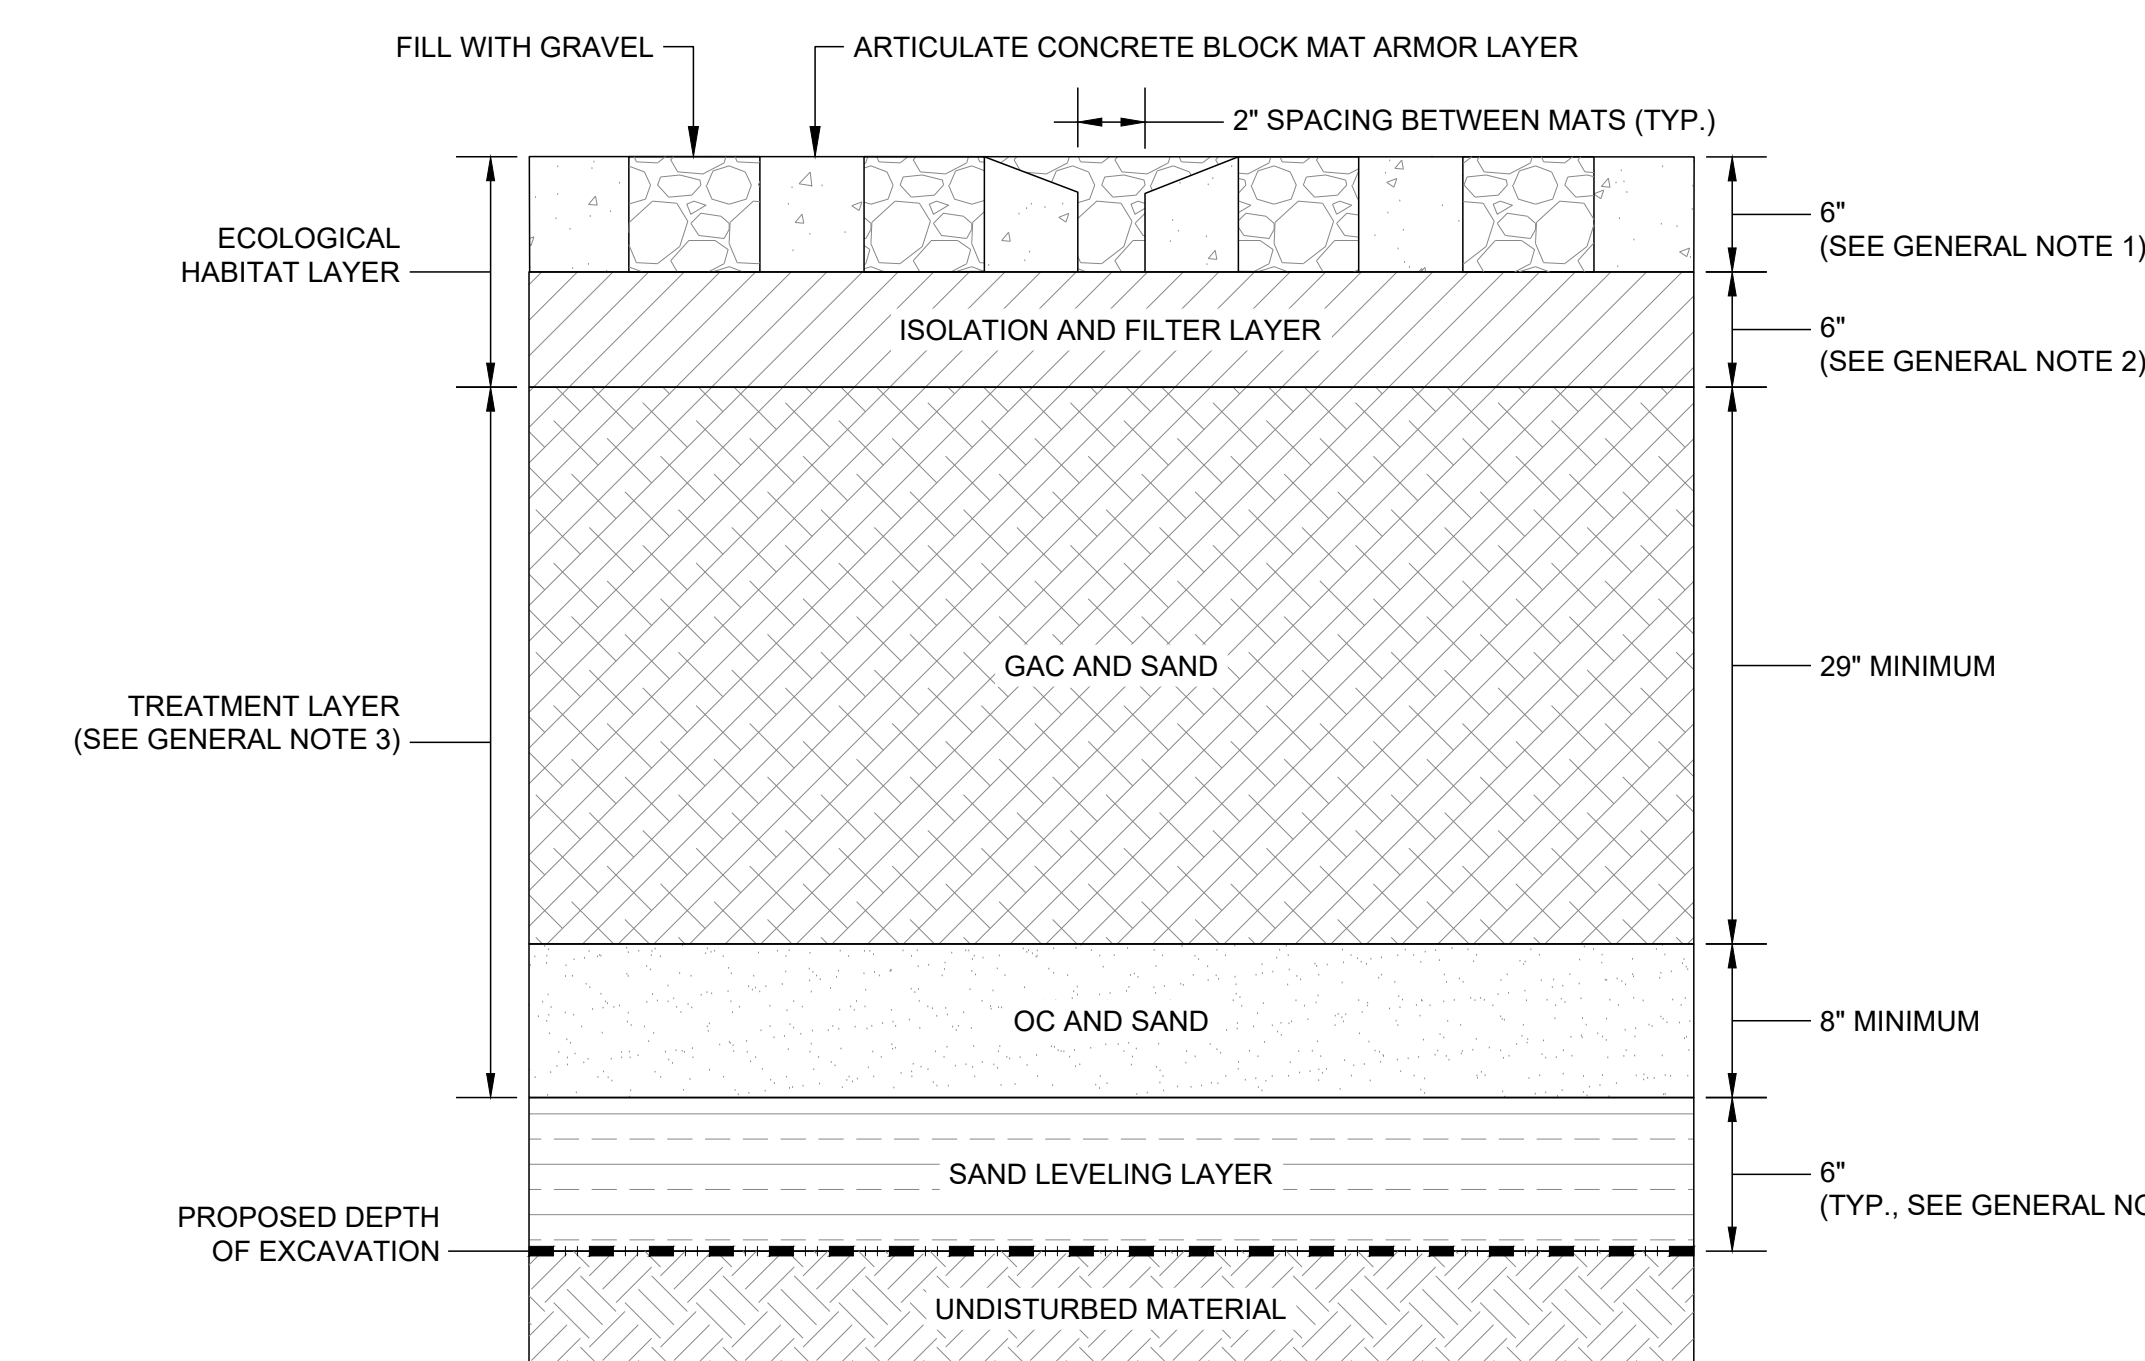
CROSS SECTION OF TRANSITION BETWEEN RTA 1 AND TYPE 1
